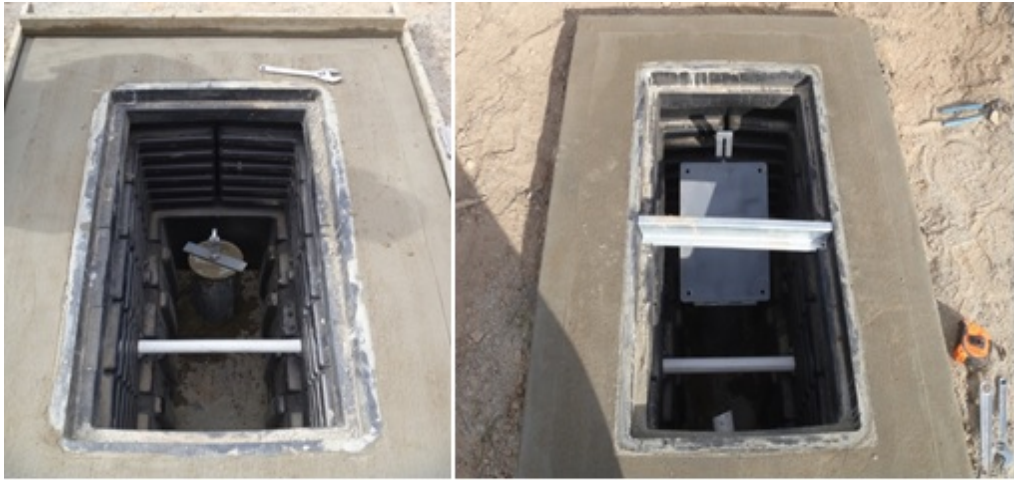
Brackets concreted into bollards for anchor end (left) and live end (right)
